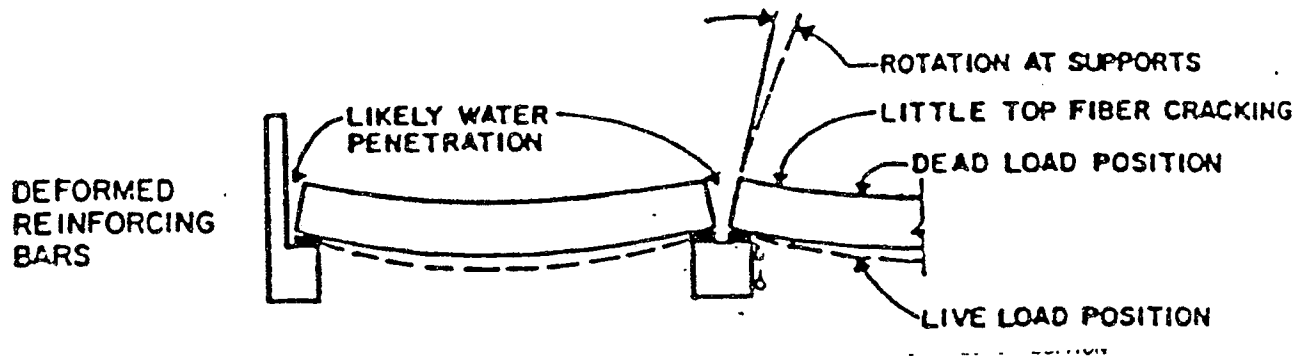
Schematic Simple Span Slab Construction under gravity Loads (using deformed bar reinforcing) [4]
